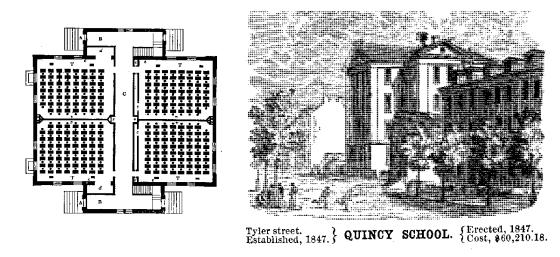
Quincy School and plan, constructed in 1847.⁶
